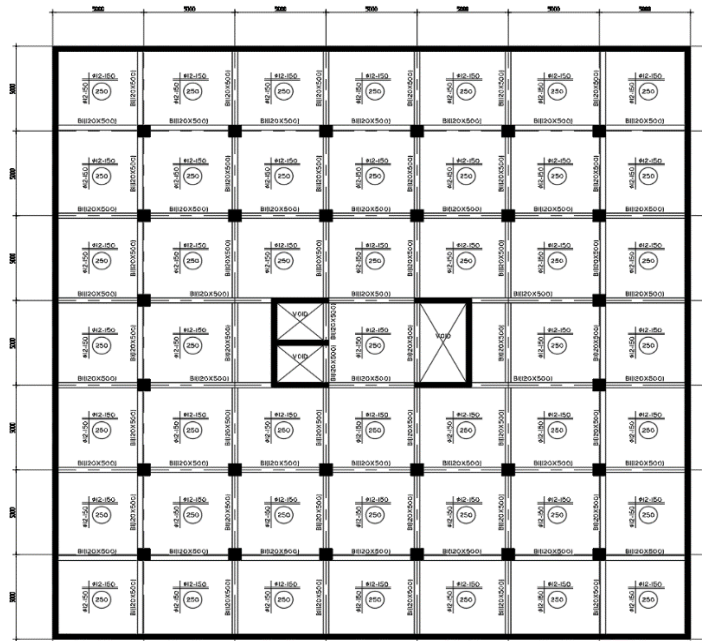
1st & 2nd case study geometry (for two stories in basements)
